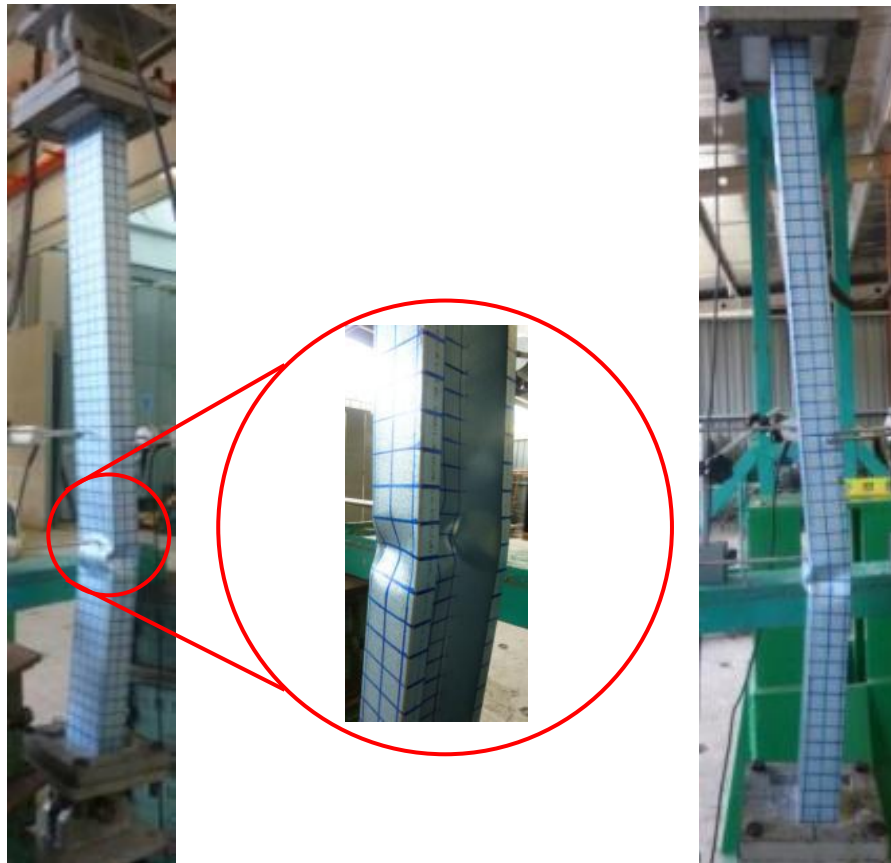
Failure Modes of Tested C90L1000 C-channel Columns
